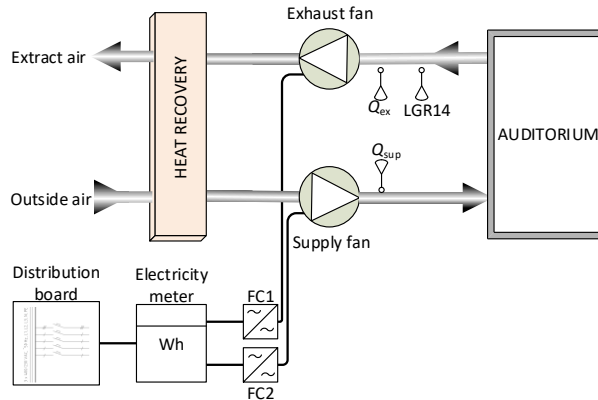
Ventilation system 306SV layout and placement of measurement equipment [Paper III].
